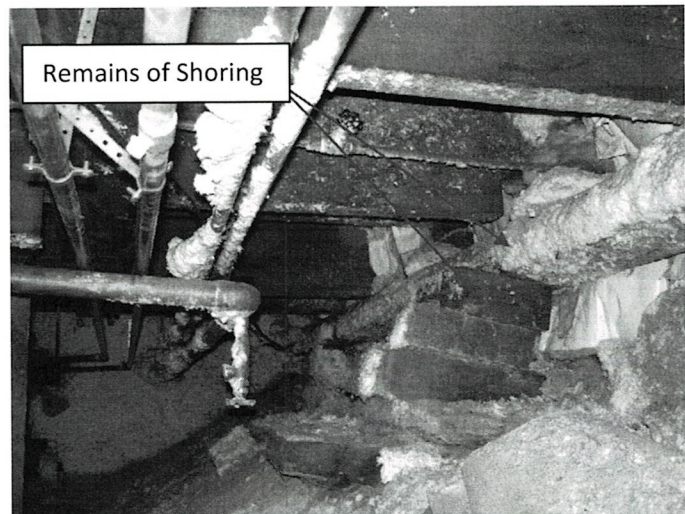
Plumbing, rubble, and insulation prevented closer observation of this north crawl space wall. Once shored these joist connections could not be observed
